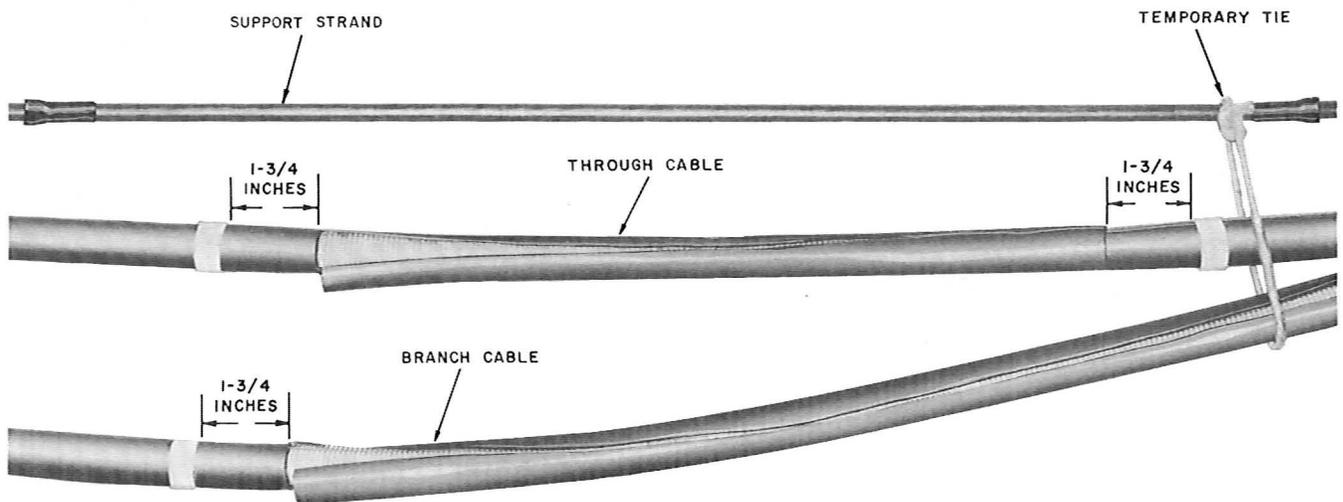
Polyethylene Sheath—Marked, Cut, and Ready for Removal
